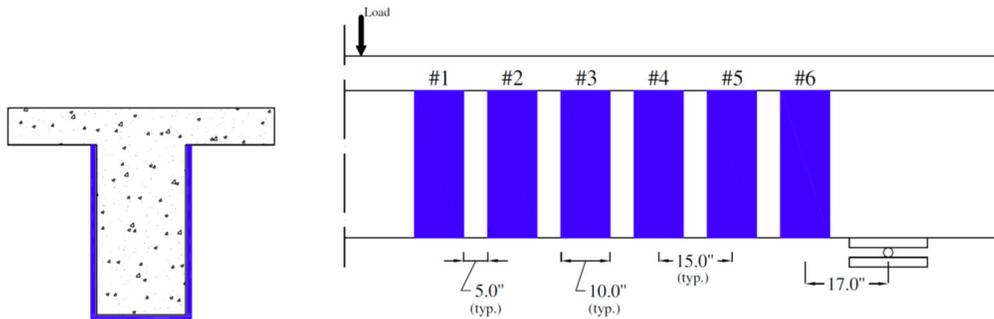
Externally bonded CFRP U-wraps for shear strengthening of RC beams [95]
